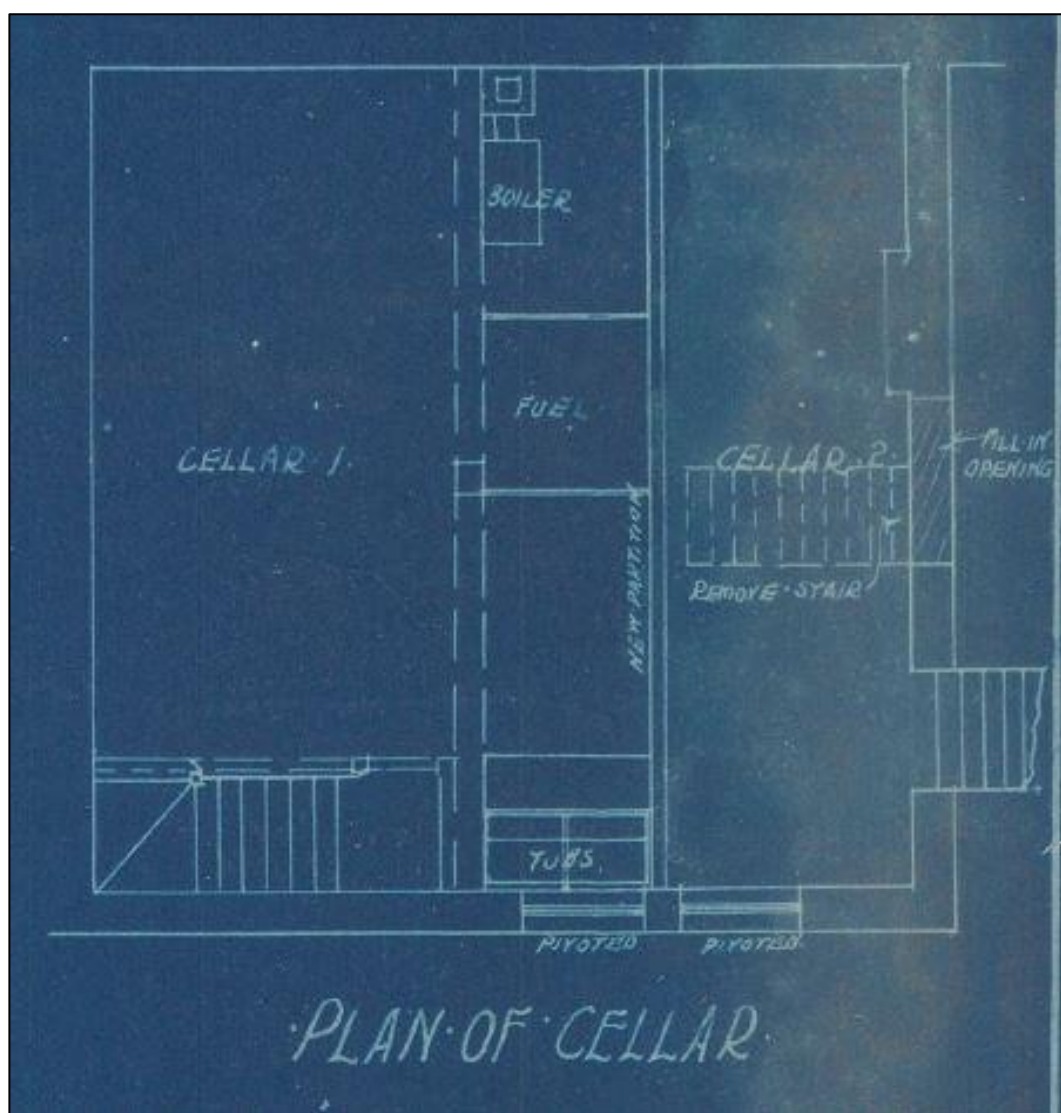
Detail from 1933 plan showing layout of cellar (Ford, 1933).
